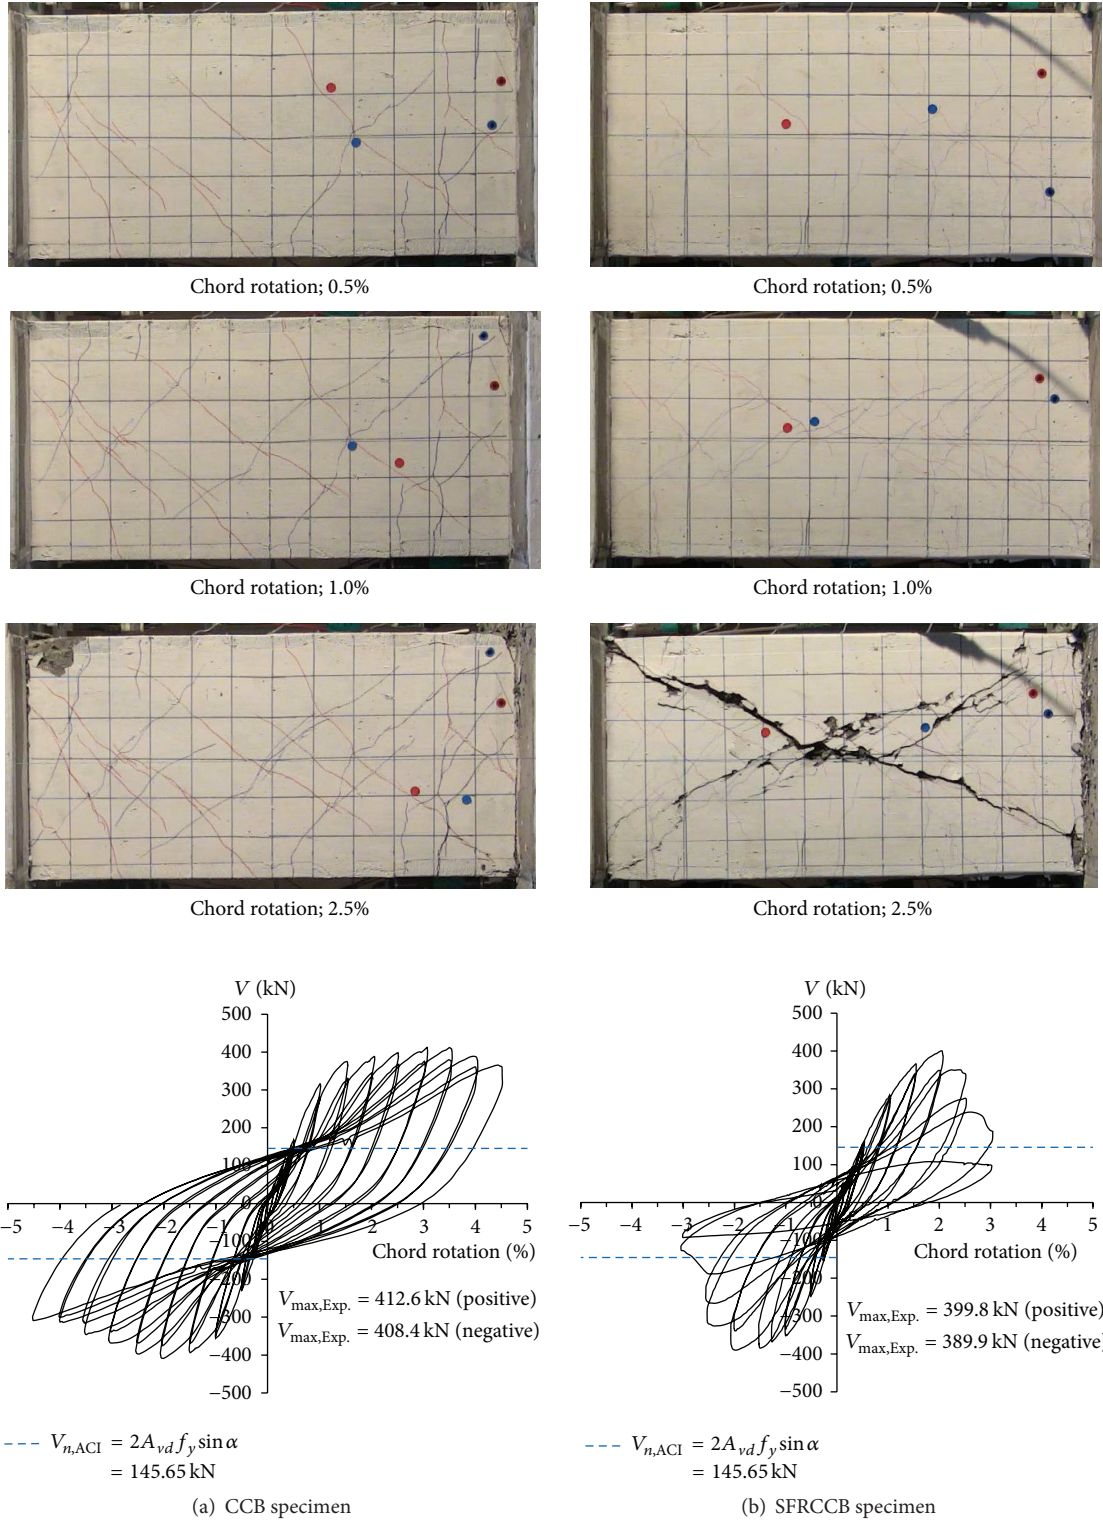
Cracking procedure and hysteretic behaviour of coupling beam specimens.
